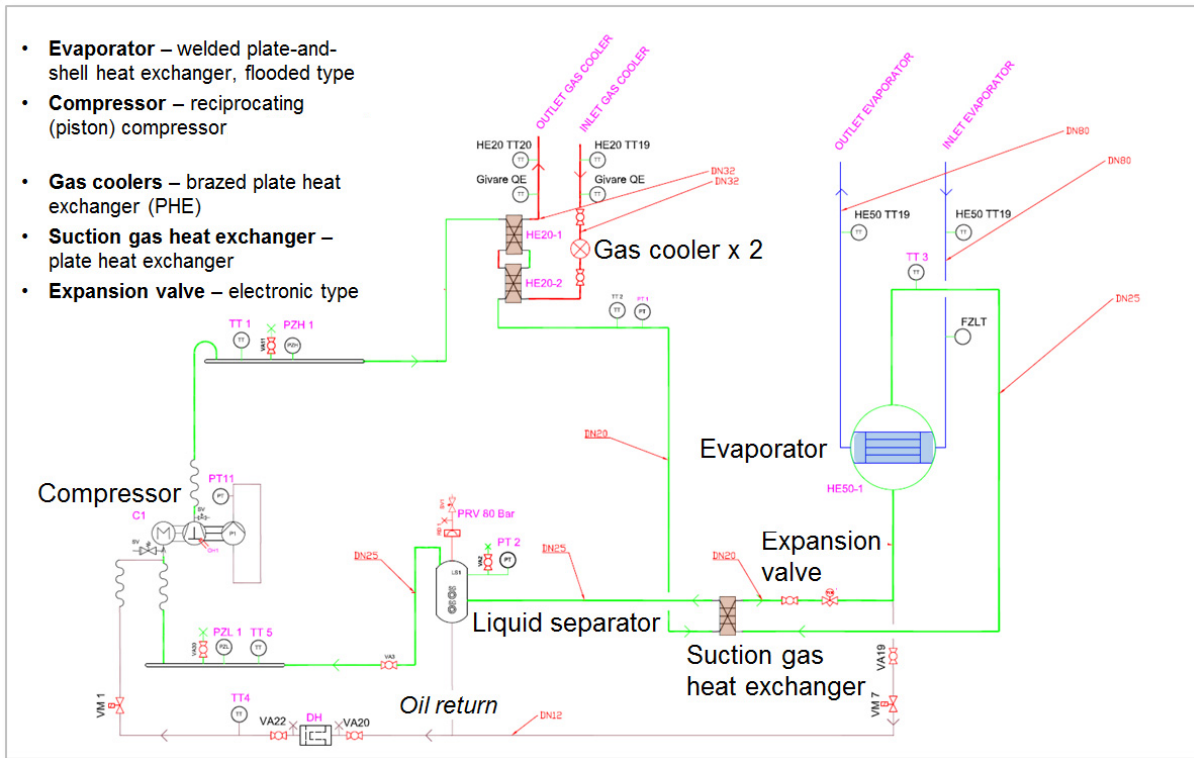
Main components and pipeline dimensions for the 100 kW CO₂ heat pump water heater unit at Tveita Borettslag (Borge, 2014).
